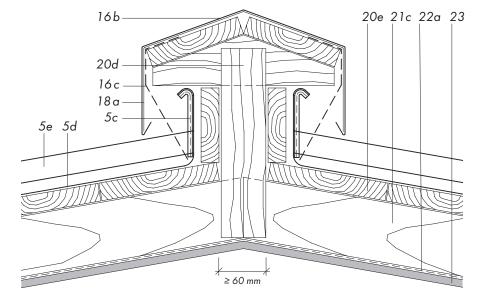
Example of ventilated double pitch ridge with roof pitches < 25°
